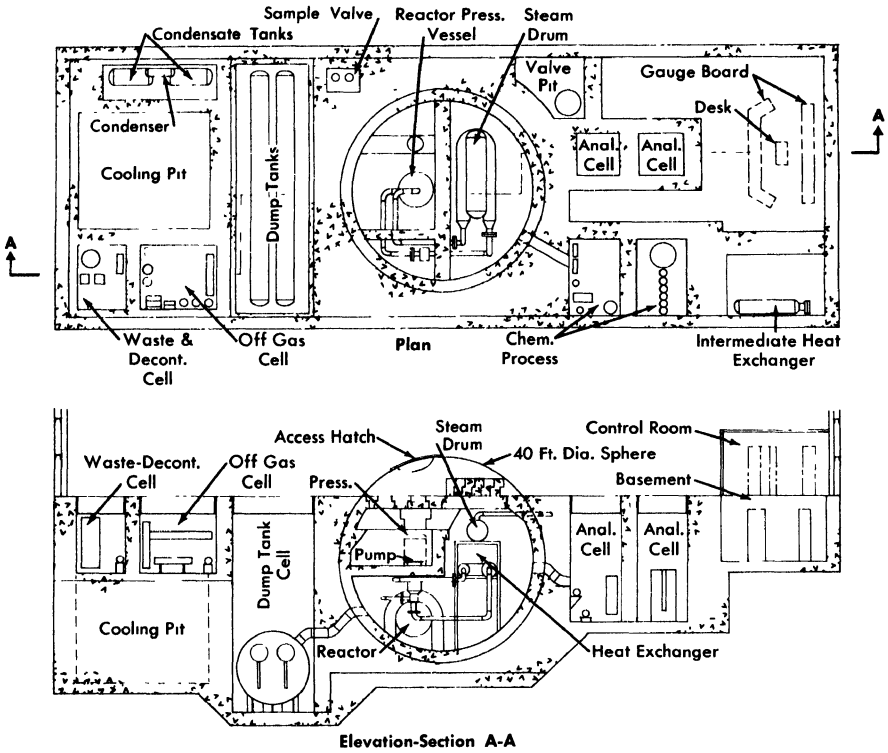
Plan and sectional elevation of revised Wolverine reactor plant.
